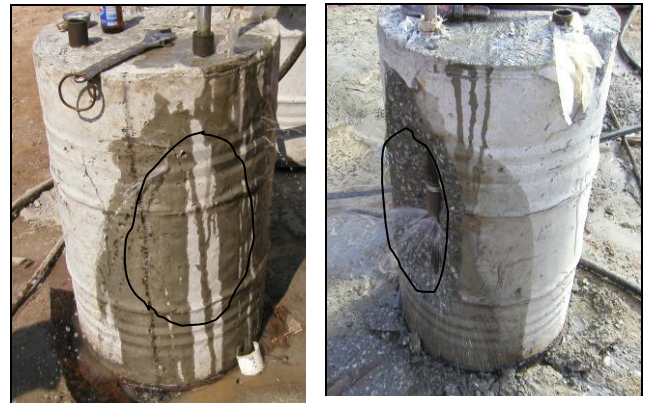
Crack Trial at 24 hrs (left), 51 hrs (right)
